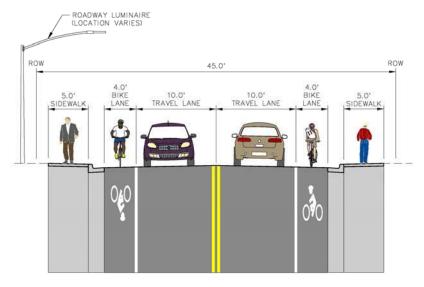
W. 30th Ave. (Spenard Road to Arctic Blvd.) - Alt. B
